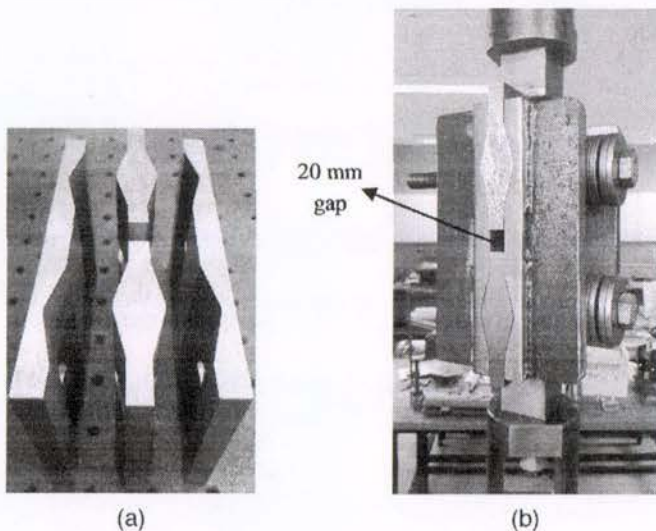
RSF joint component test: (a) manufactured plates before attaching the stiffeners to the cap plates (b) test setup and assembly of the joint
